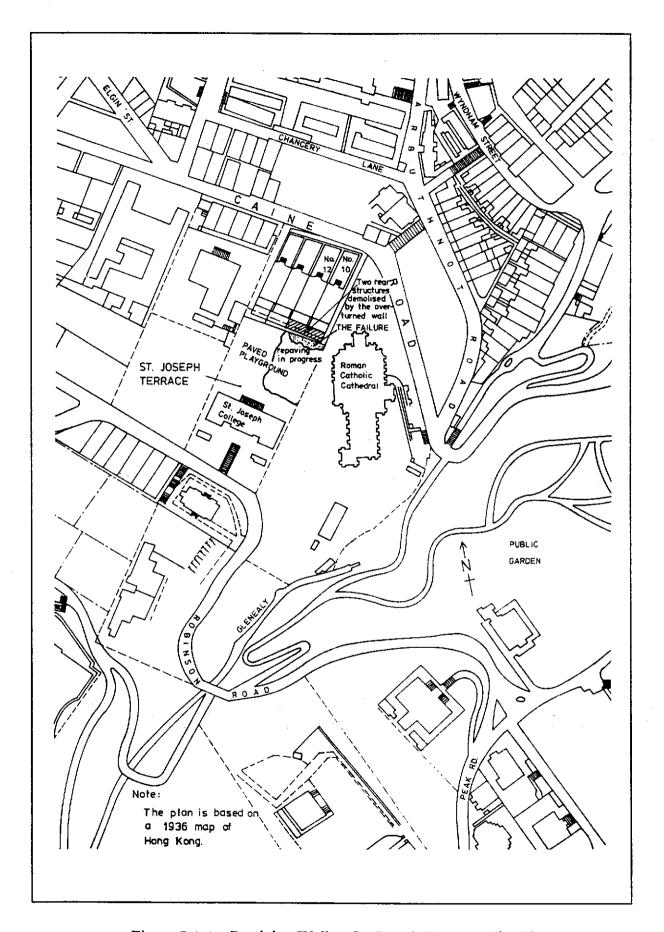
Retaining Wall at St. Joseph Terrace - Site Plan
